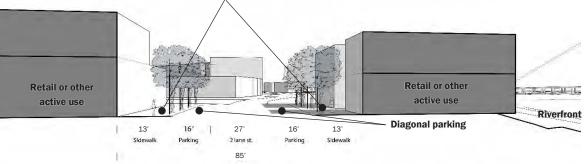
Proposed street section for McLean Boulevard at stadium, looking north.
